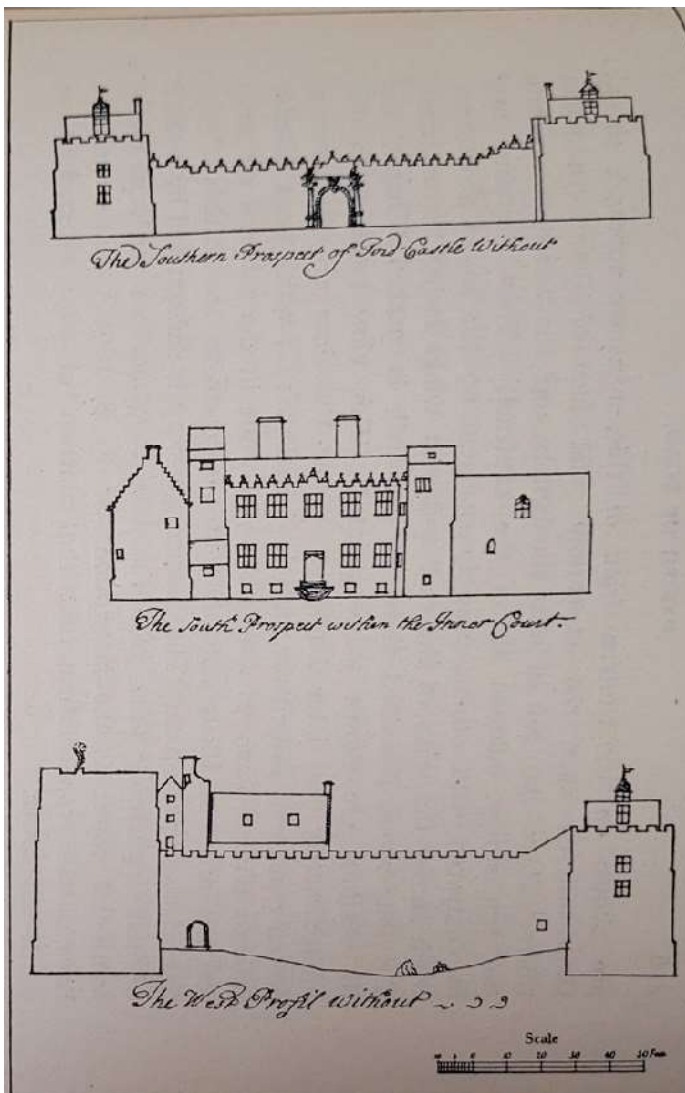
/67a John Purdys 1716 plan and elevations of Ford Castle, as pictured in , NCH XI , 415
